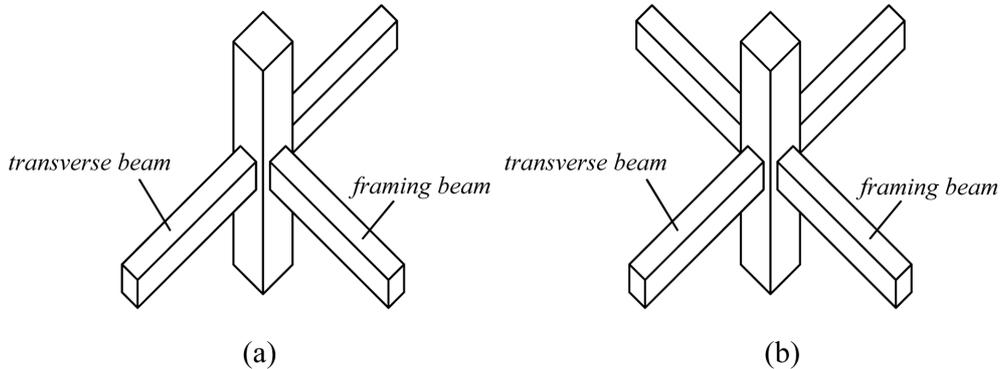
Reinforced concrete beam-column connections: (a) exterior connection, (b) interior connection
